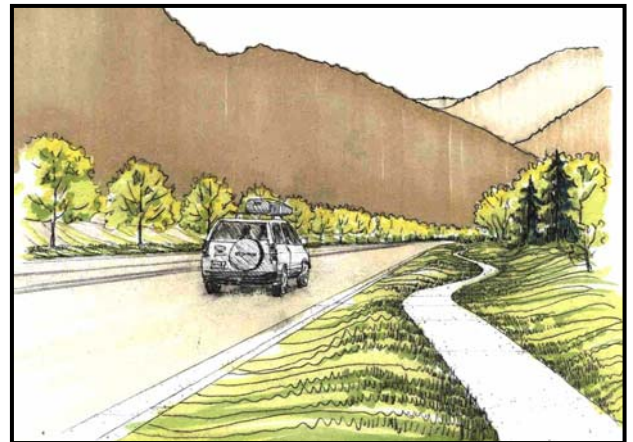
Example the streetscape with street trees, curb, gutter and sidewalks
